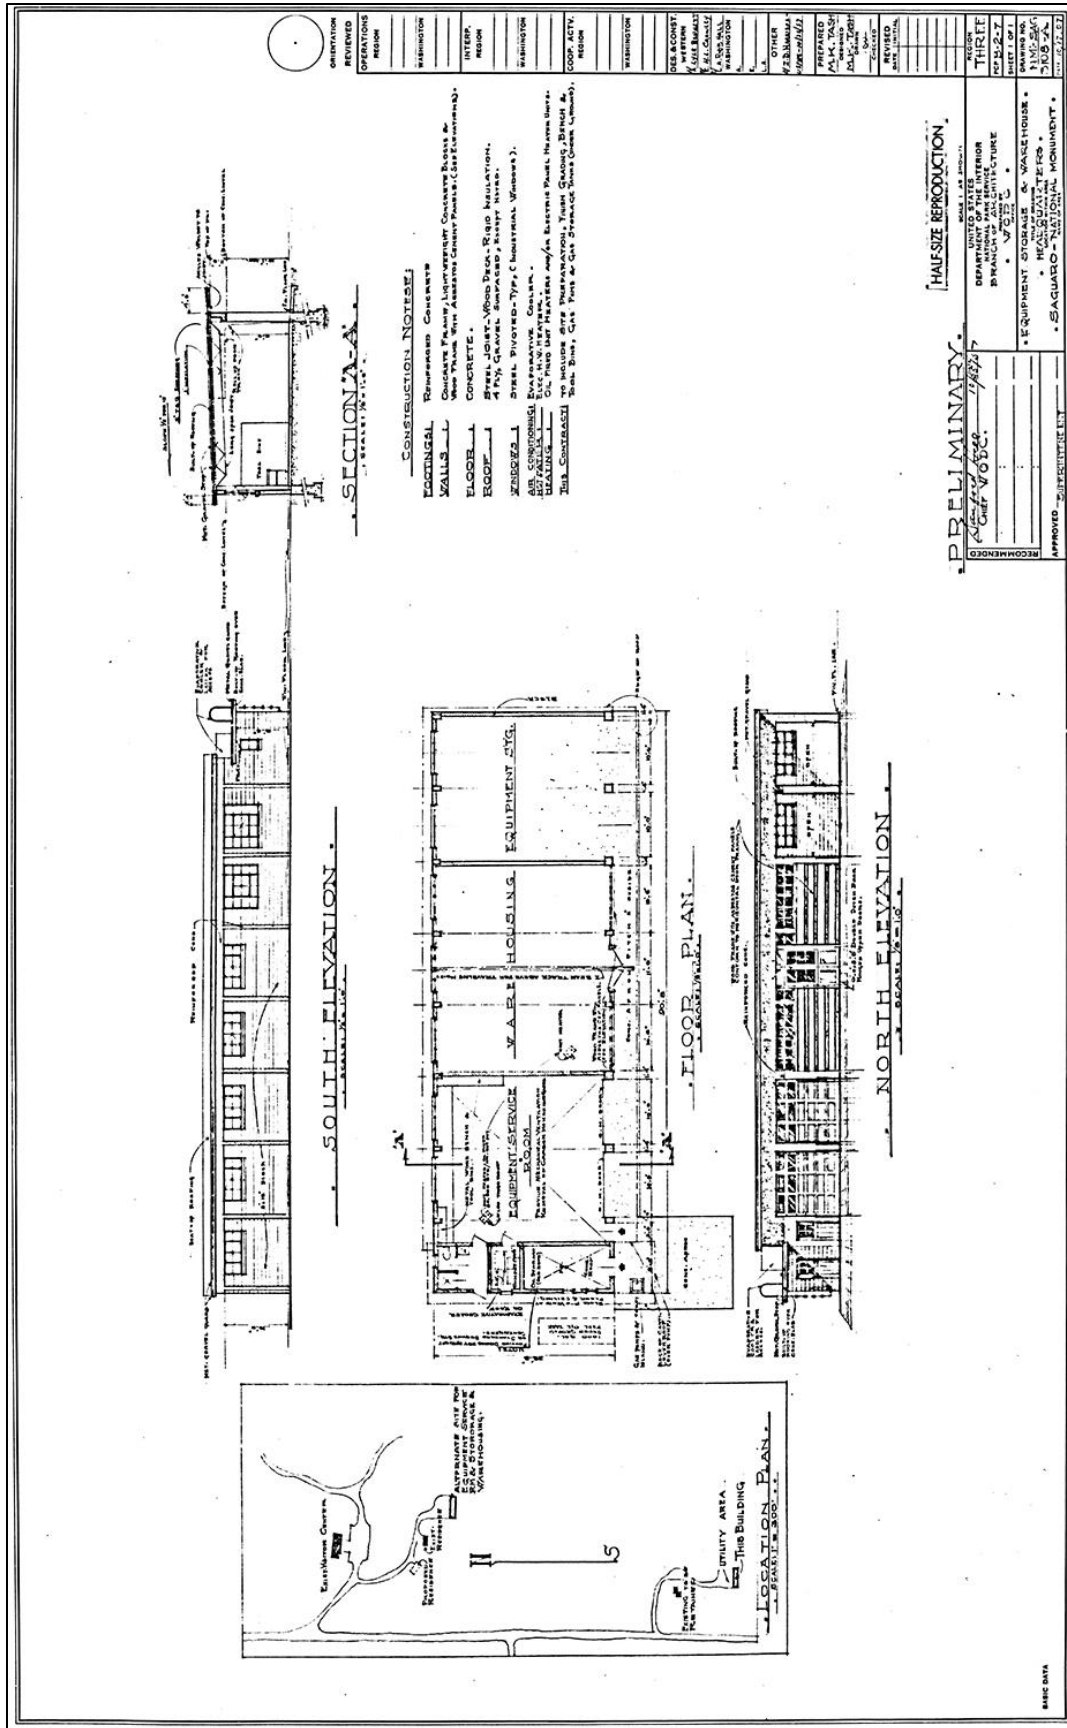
Drawing NM-SAG 3108-A, Sheet 1 of 1. Equipment Storage and Warehouse Building, Building 29. Plan and elevations, Headquarters Area, Dated Oct. 1957.
